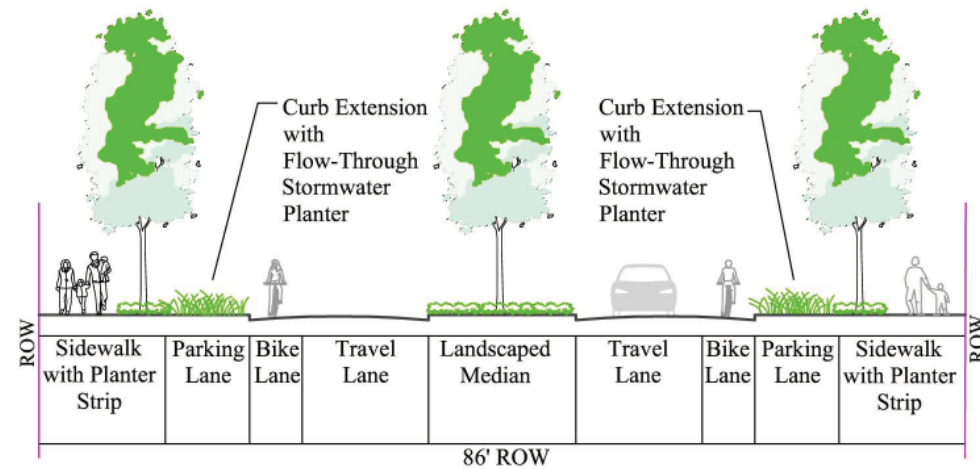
Ridge Parkway and Central Parkway Green Streets
